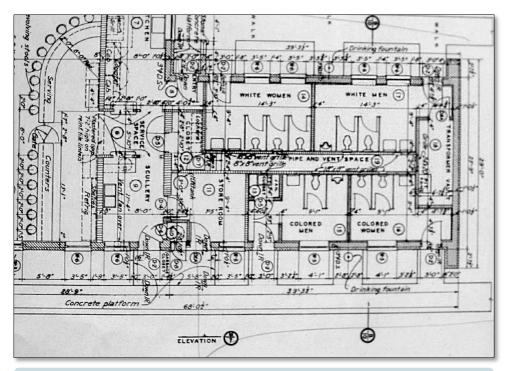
Excerpt of 1947 floor plan for the overlook station showing the restroom section of the proposed building.
